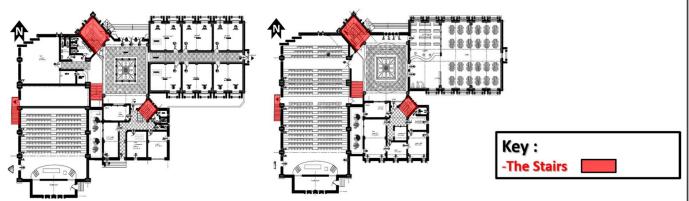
Ground Floor plan- source: Architectural Office Khelili Abd Hafid + Student
